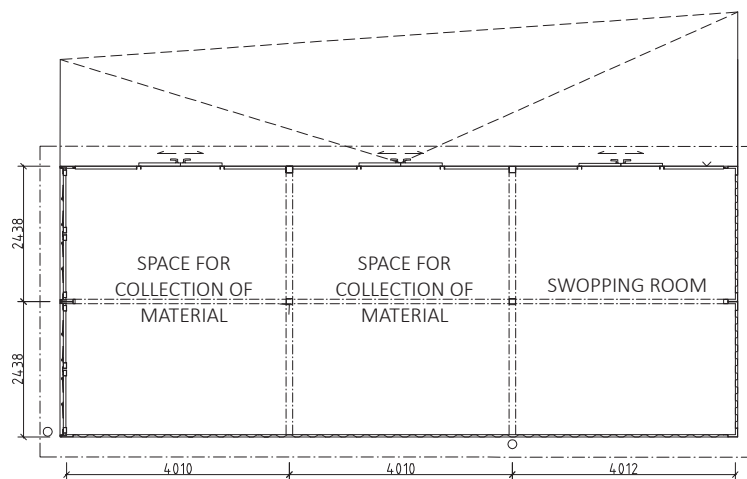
Plan of Bråta Pavilion (Helhetshus Arkitektstudio 2016)
